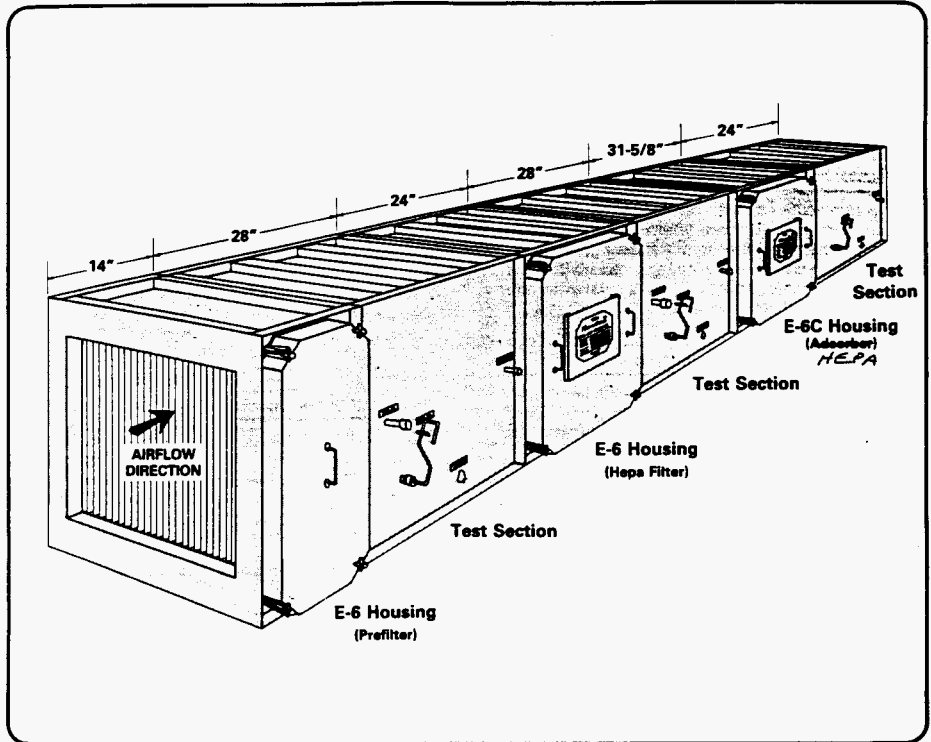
E-6 Filter Housings with In-Place Test Sections
